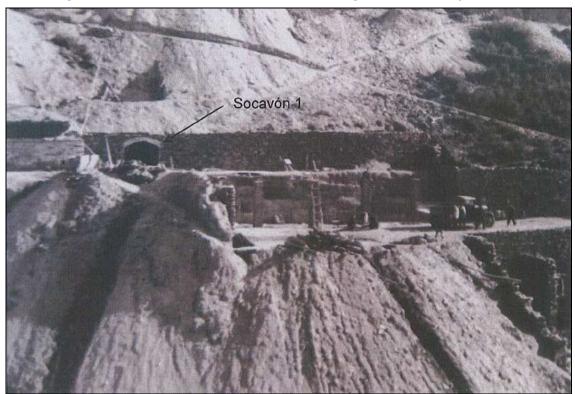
Construction of Historical Ore Washing Plant and Gallery Entrance
